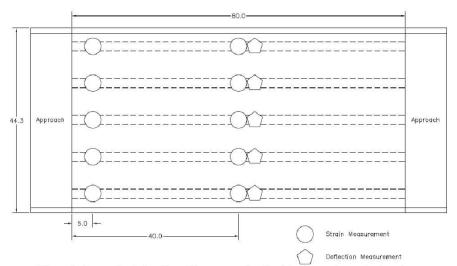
Approximate location of temporary live load testing equipment, plan view.
